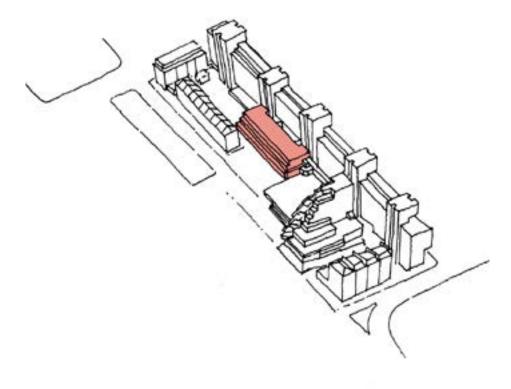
Aerial view of the listed building, viewed from the south; Lasdun's library extension, built in 1993, is highlighted Alan Baxter
